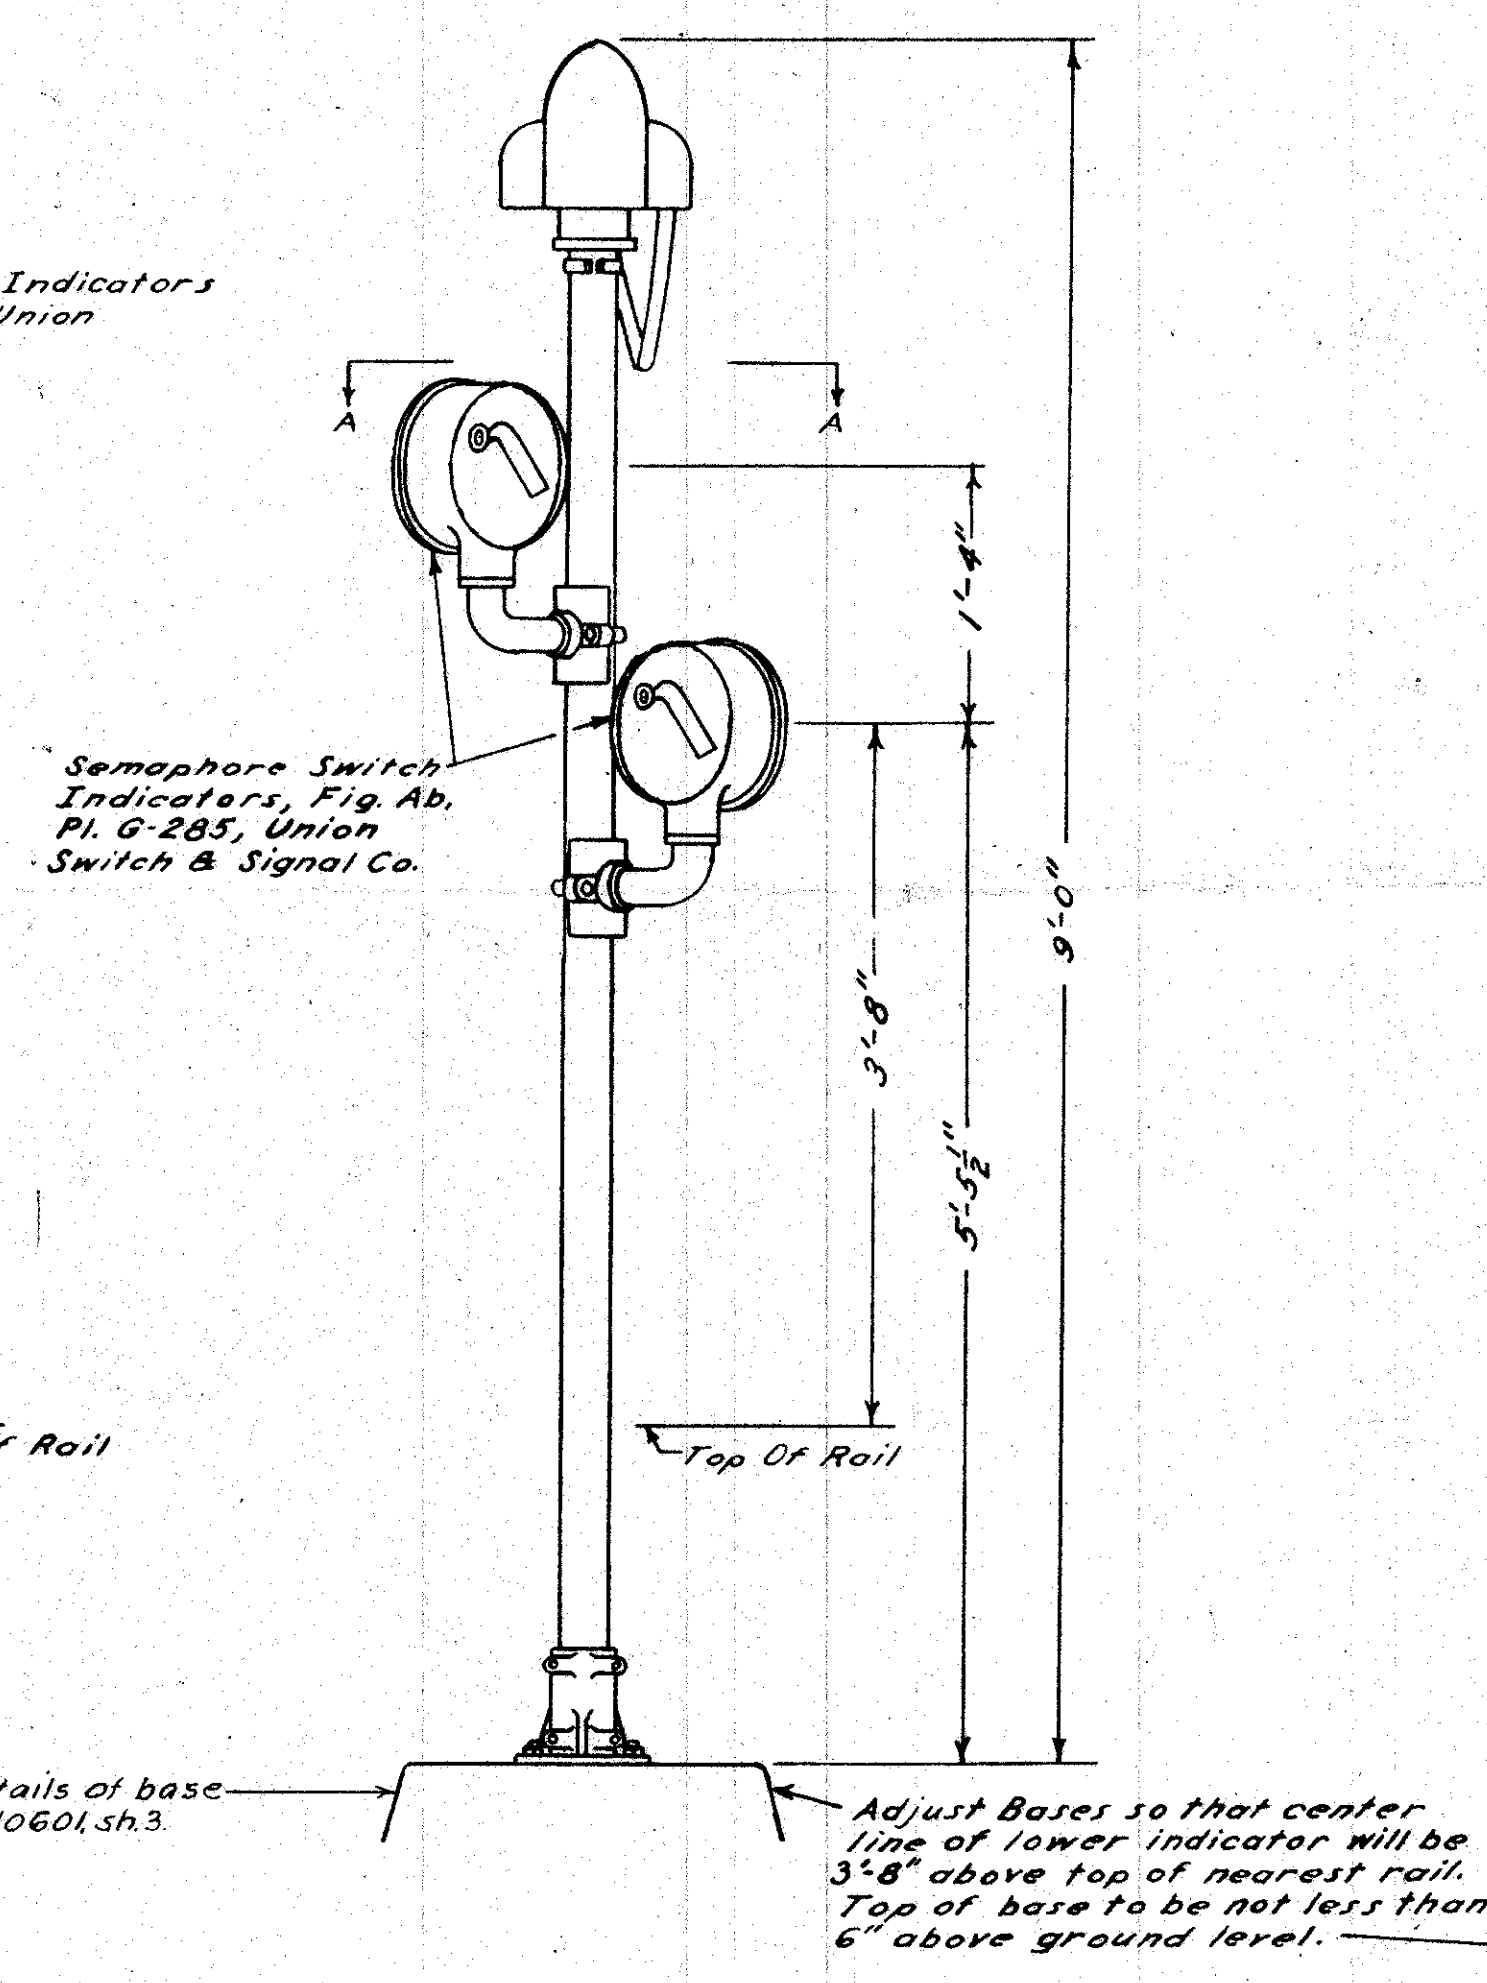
TRACK CAR INDICATORS WITH CABLE POST
